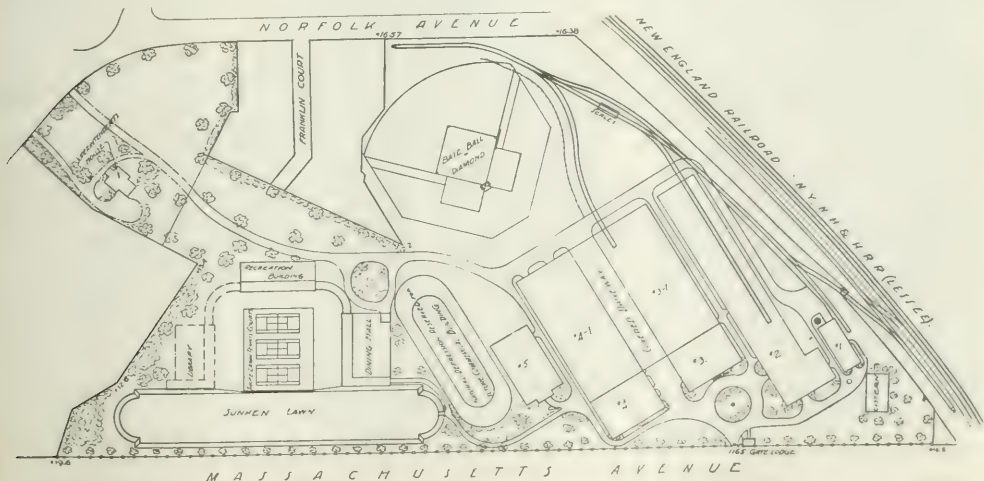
PLAN OF EDISON SERVICE BUILDINGS, BOSTON
